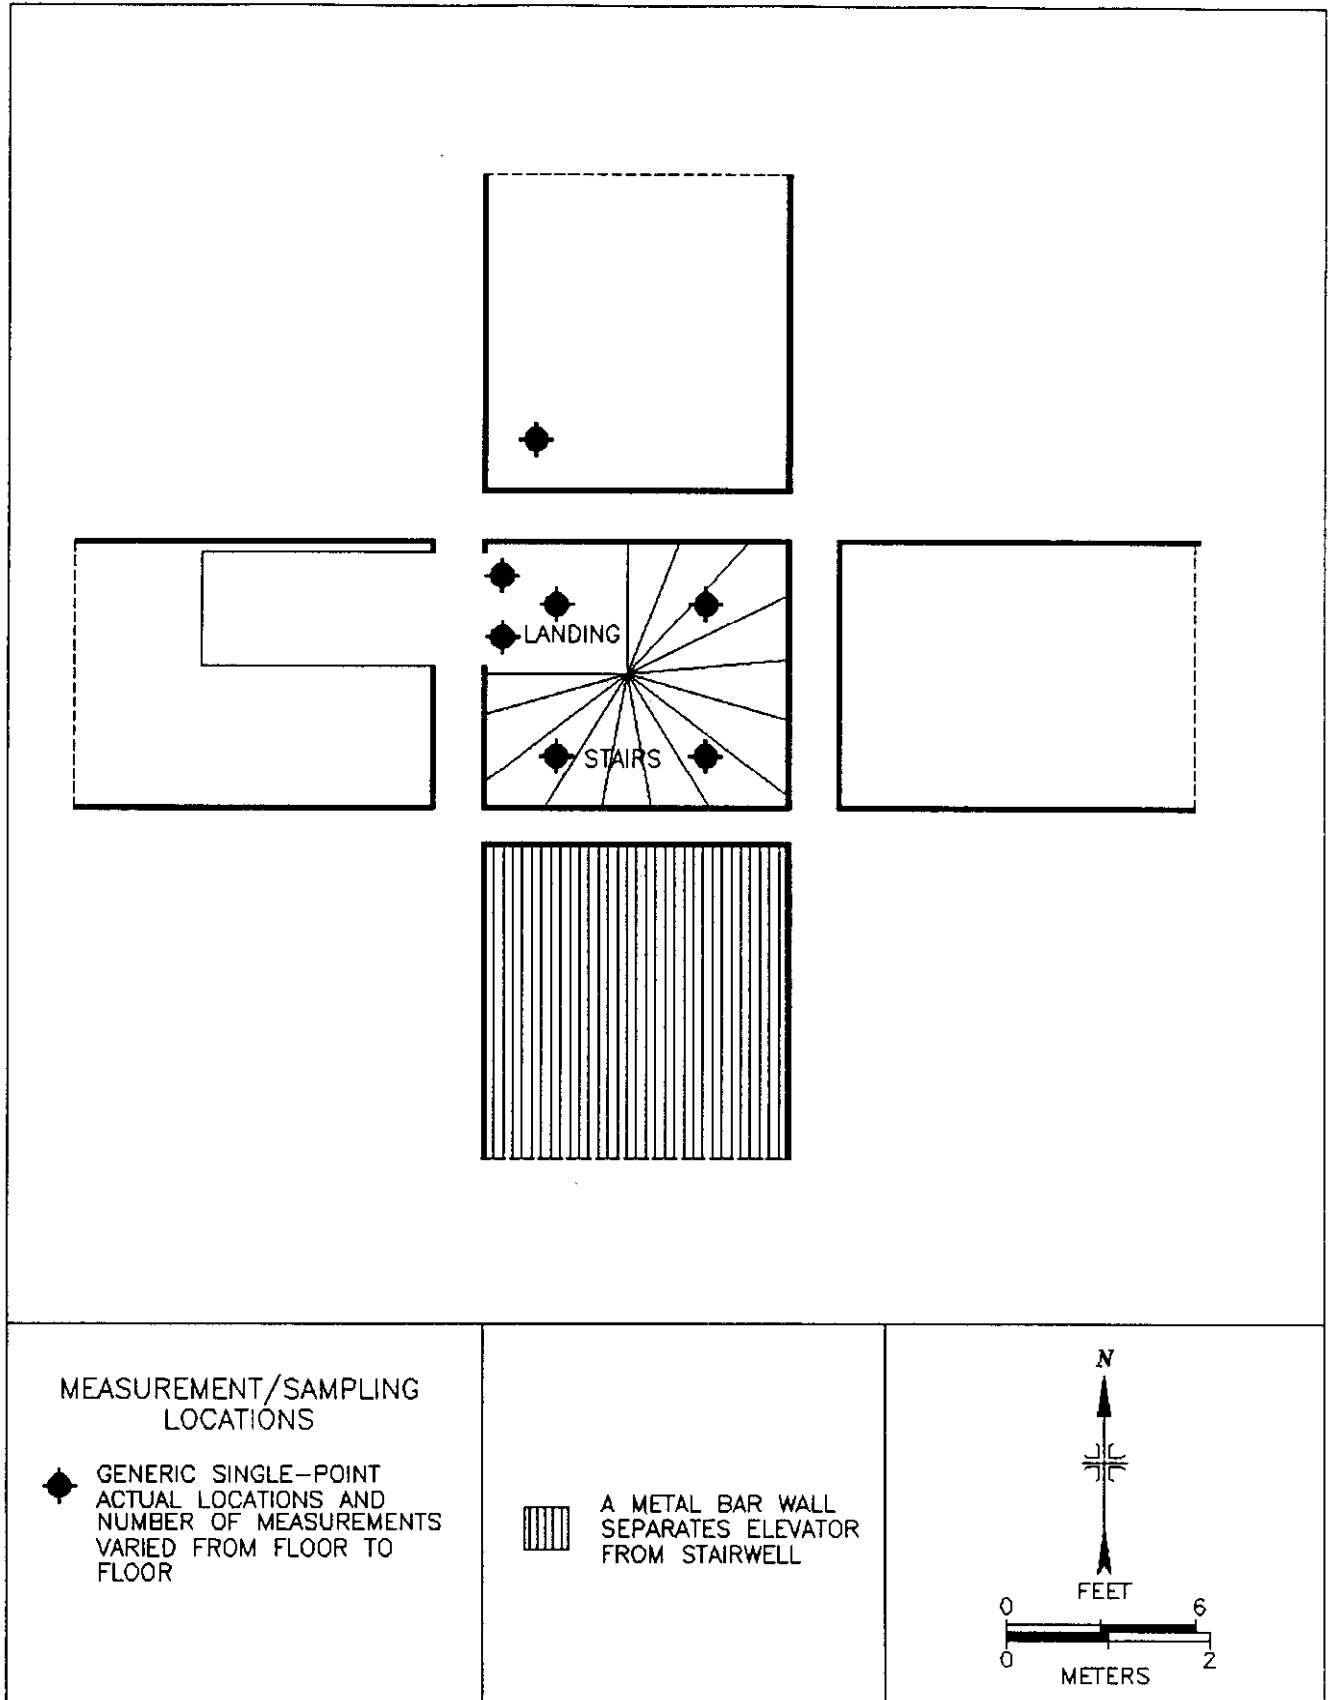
Stairwell, West Bay – Measurement and Sampling Locations
